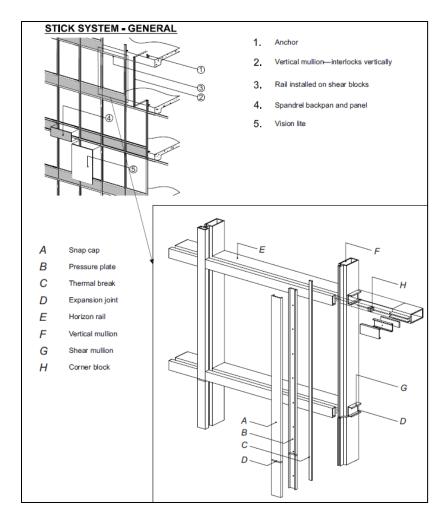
Stick-built Curtain Wall Systems configuration and installation (source: CMHC Guide, 2004)
